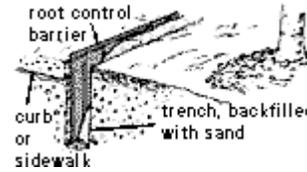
A vertical underground barrier will help keep tree roots from damaging concrete as they grow.
